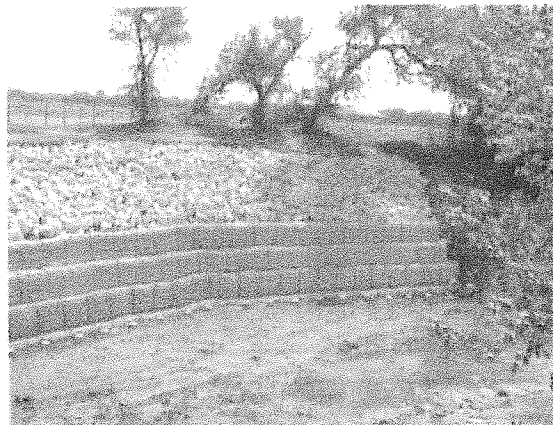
Streambank Protection: Gabion Baskets with rock armor.
